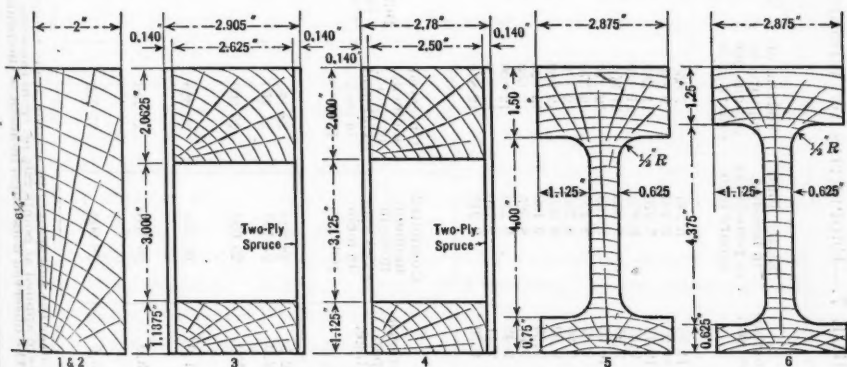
SECTIONS OF SPRUCE TEST BEAMS.
